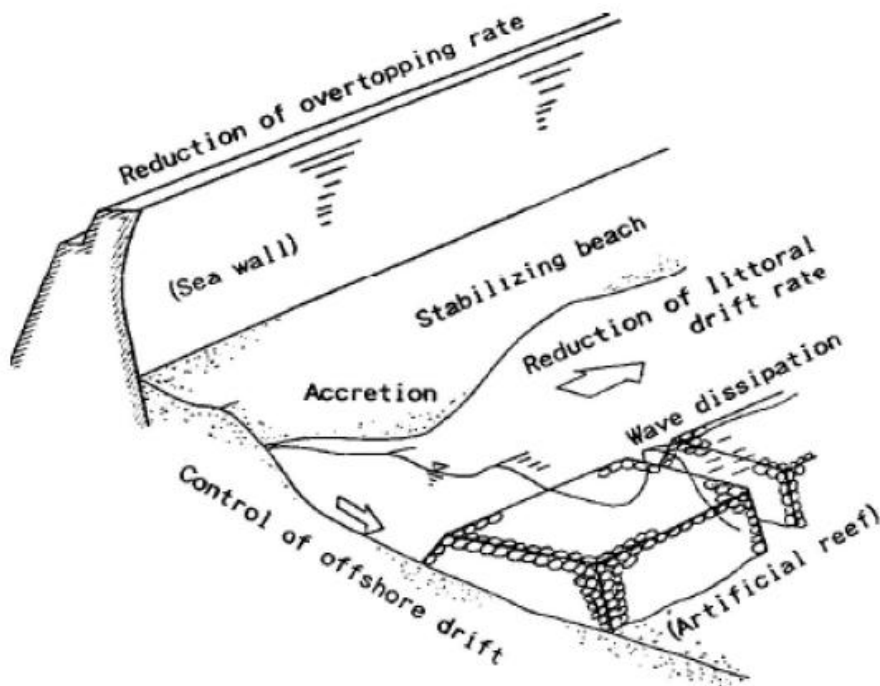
Typical multiple reef layout used in Japan (Pilarczyk 2003)
